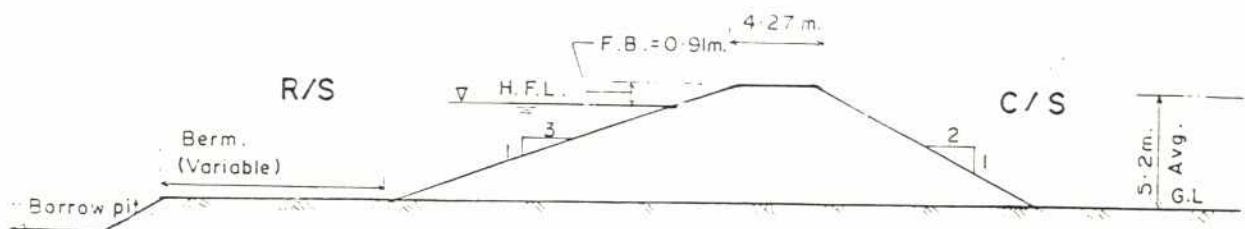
TYPICAL EMBANKMENT SECTION OF
